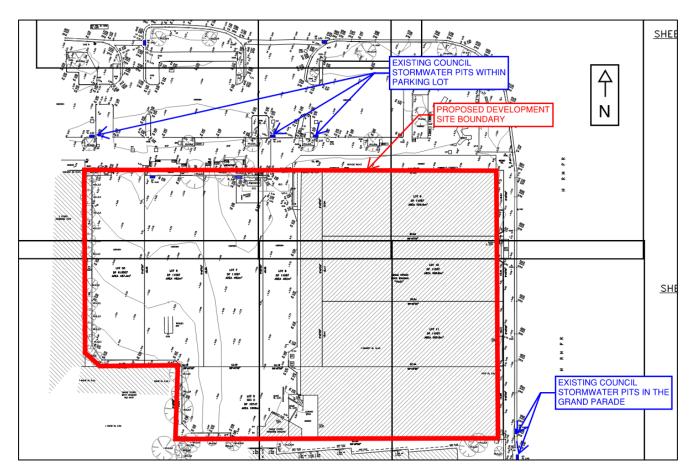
Existing Stormwater Infrastructure (Source: Citisurv)
